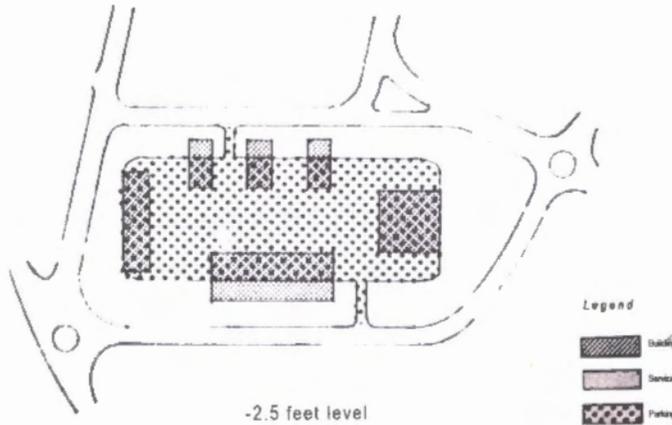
Proposed development – at -2.5feet level for parking, retail activities and offices
